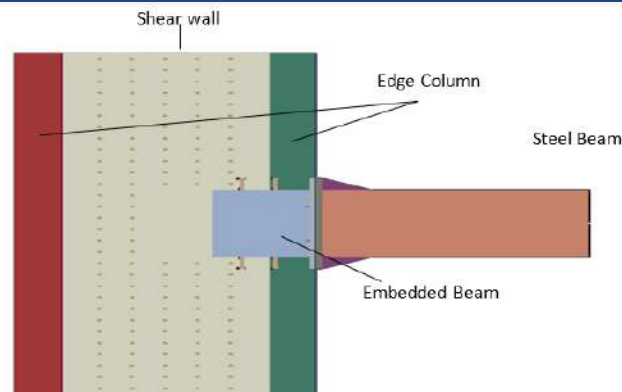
Vertical section of Double Skin Composite Shear wall highlighting the loading and embedded beam with the cross section of shear wall
